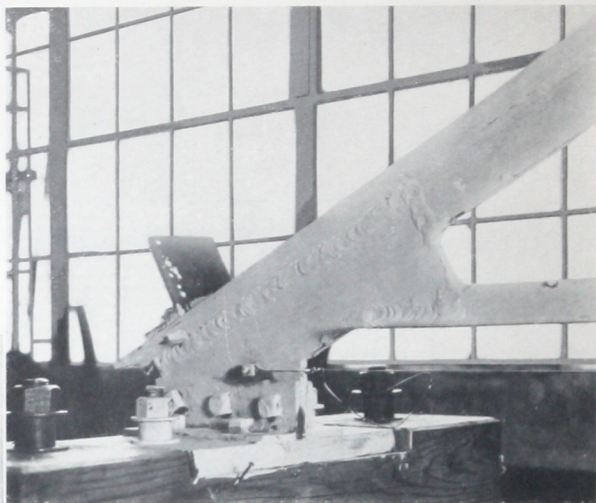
(*left*). The free end employed a set of rollers mounted on a rocker casting between a lubricated I-beam race
